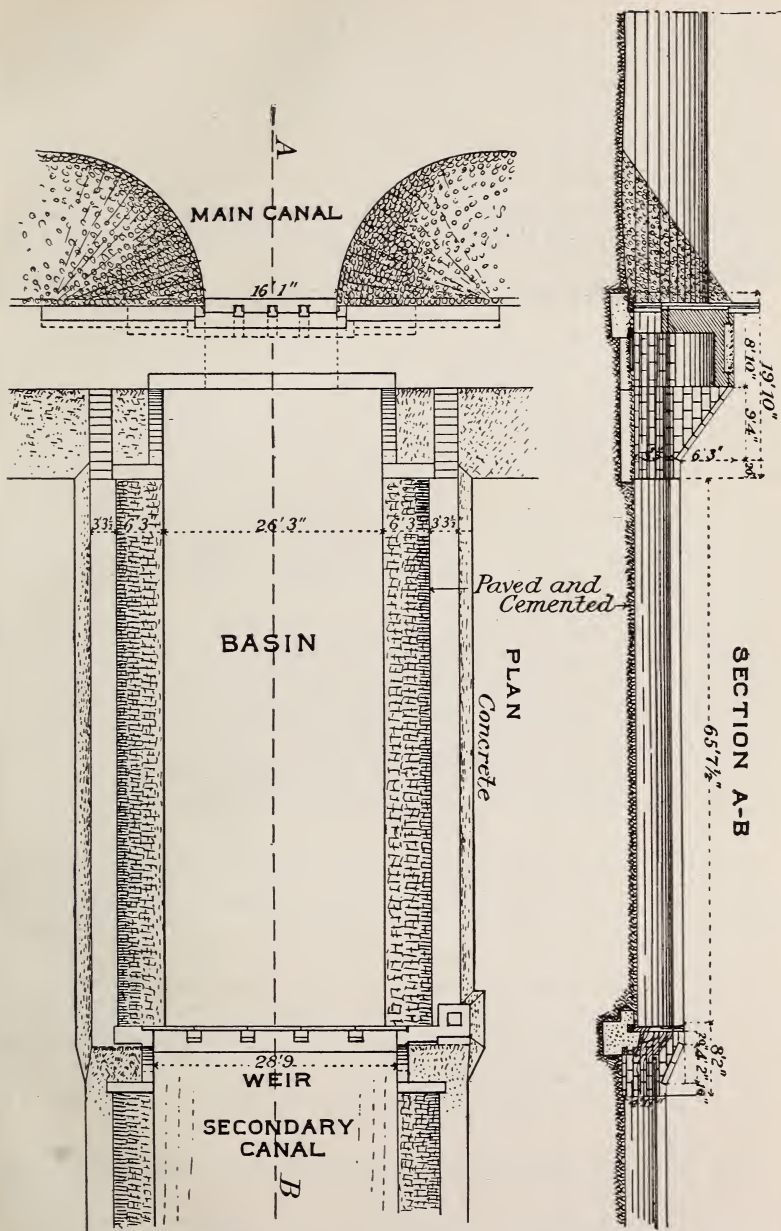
Ground plan and longitudinal section of regulating gates, basin, and measuring weir at the head of a secondary canal.
